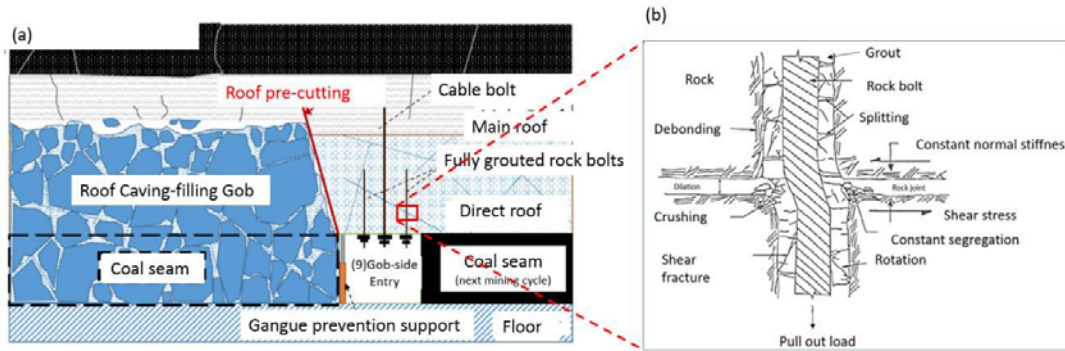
The reinforcement of coal layers in underground coal mining (longwall mining): (a) cross-section of the longwall mine at gob-side entry (modified from Zhu et al. (2018)), (b) mechanical behaviour of bolted rock joint subjected to combined pull-shear load (modified from Indraratna and Haque (2000)).
